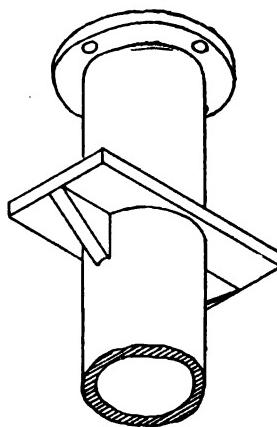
Detail of Top of Cast-Iron Column for Use with Wooden Girders.
